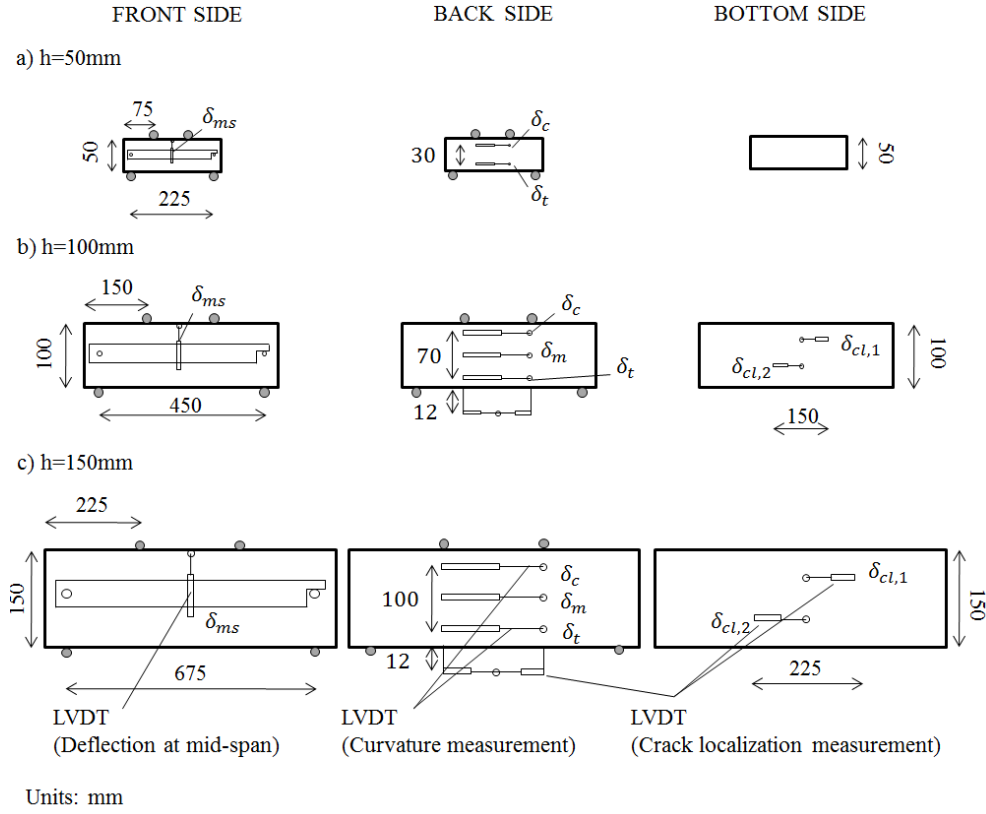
Specimen geometries and location of LVDT's used.
